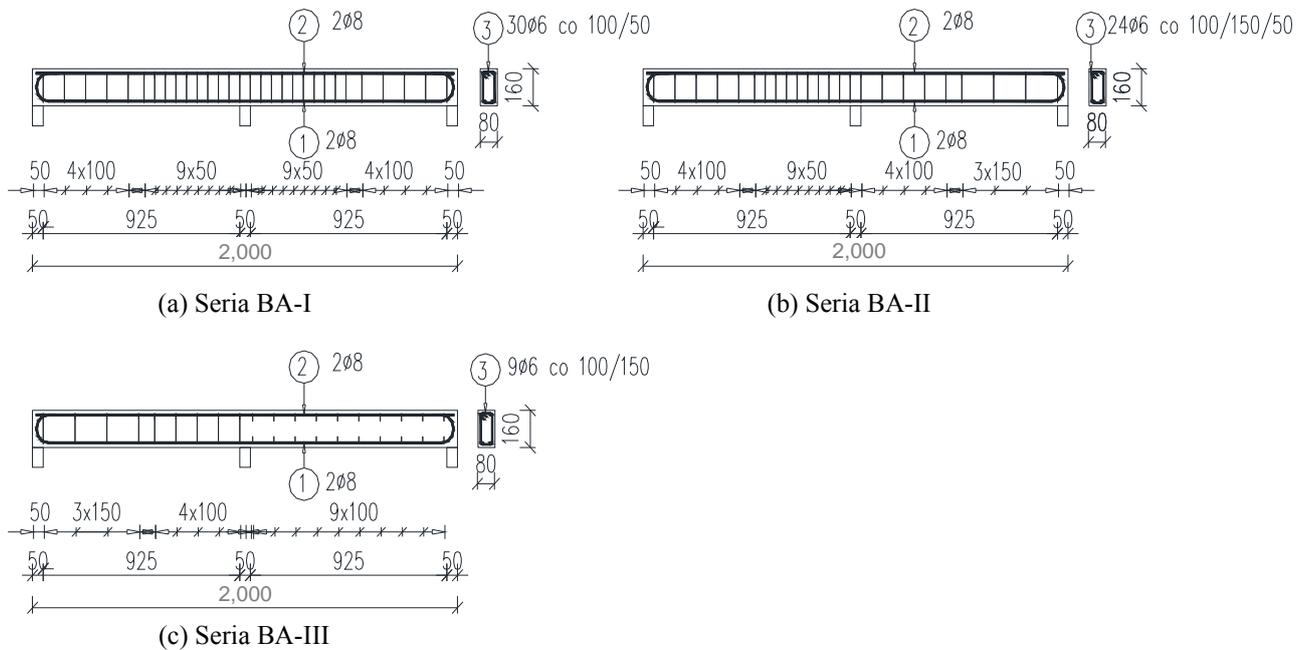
Scheme of tested BFRC beams with varied spacing of stirrups: (a) Series BA-I—identical spacing of stirrups on two spans; (b) Series BA-II—right span with twice increased spacing of stirrups compared to Series A-I; (c) Series BA-III—right span without stirrups [9].
